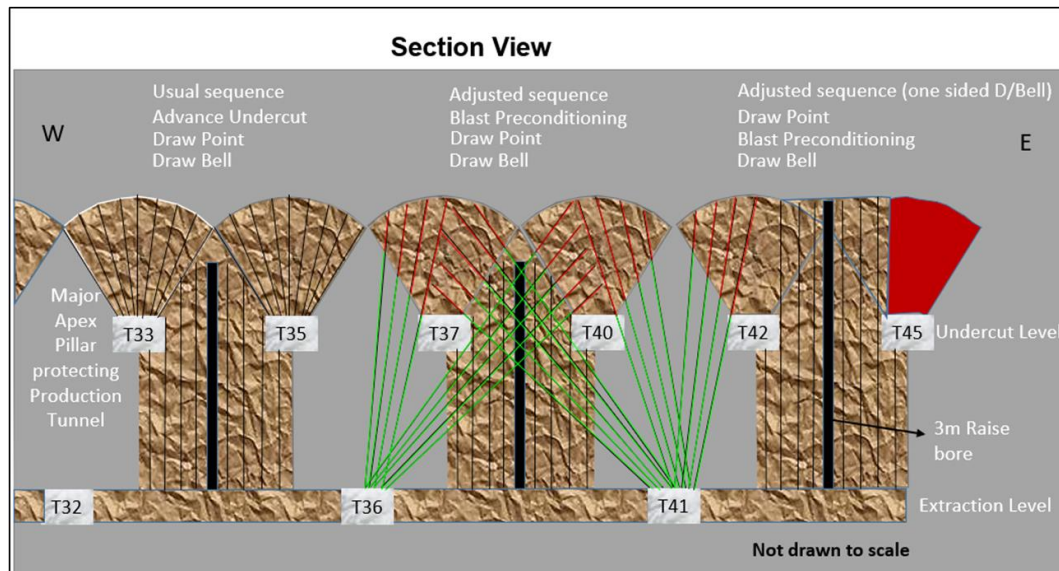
Section view showing drilled holes and sequence of mining (Courtesy of the Drill & Blast Engineering team, 2021)
